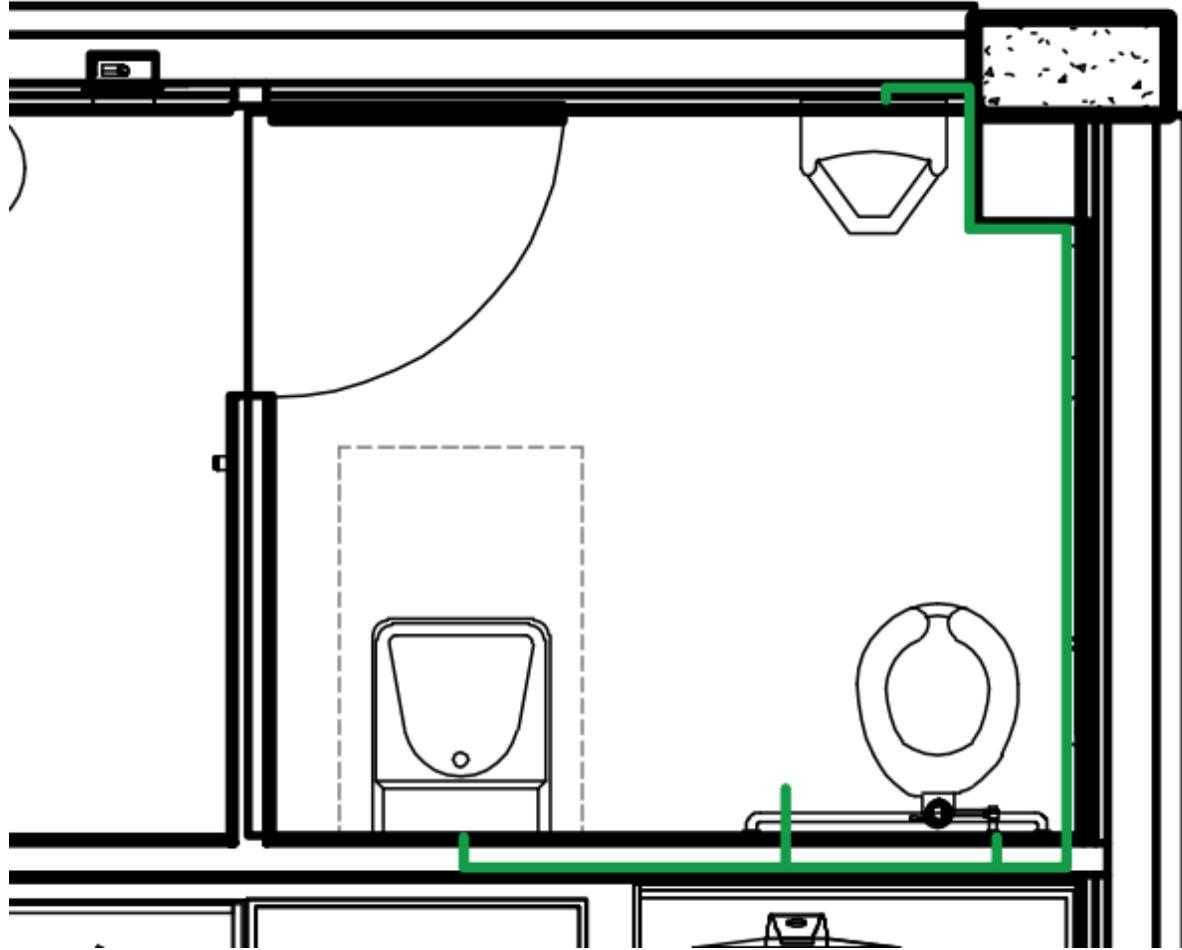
2D Sewer Pipe System Floor 2 (Enhanced View)
